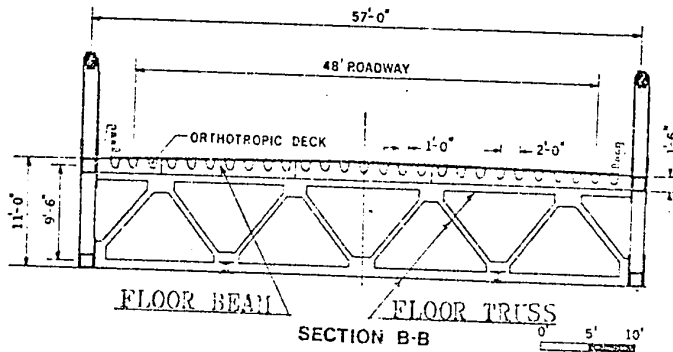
CROSS SECTION OF THE BRIDGE
